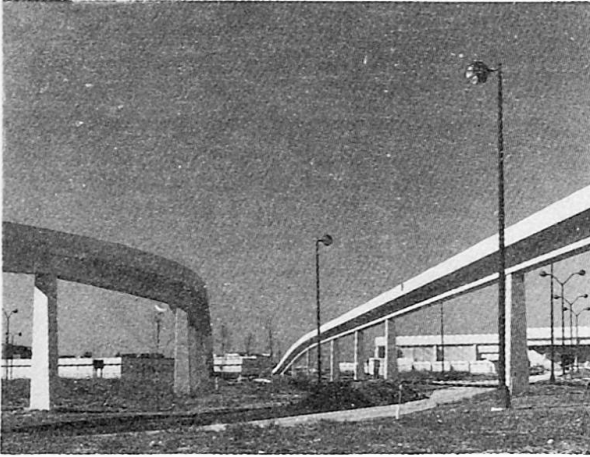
Straight stems and curved decks offer economy during construction at the Dallas/Fort Worth Airport.
